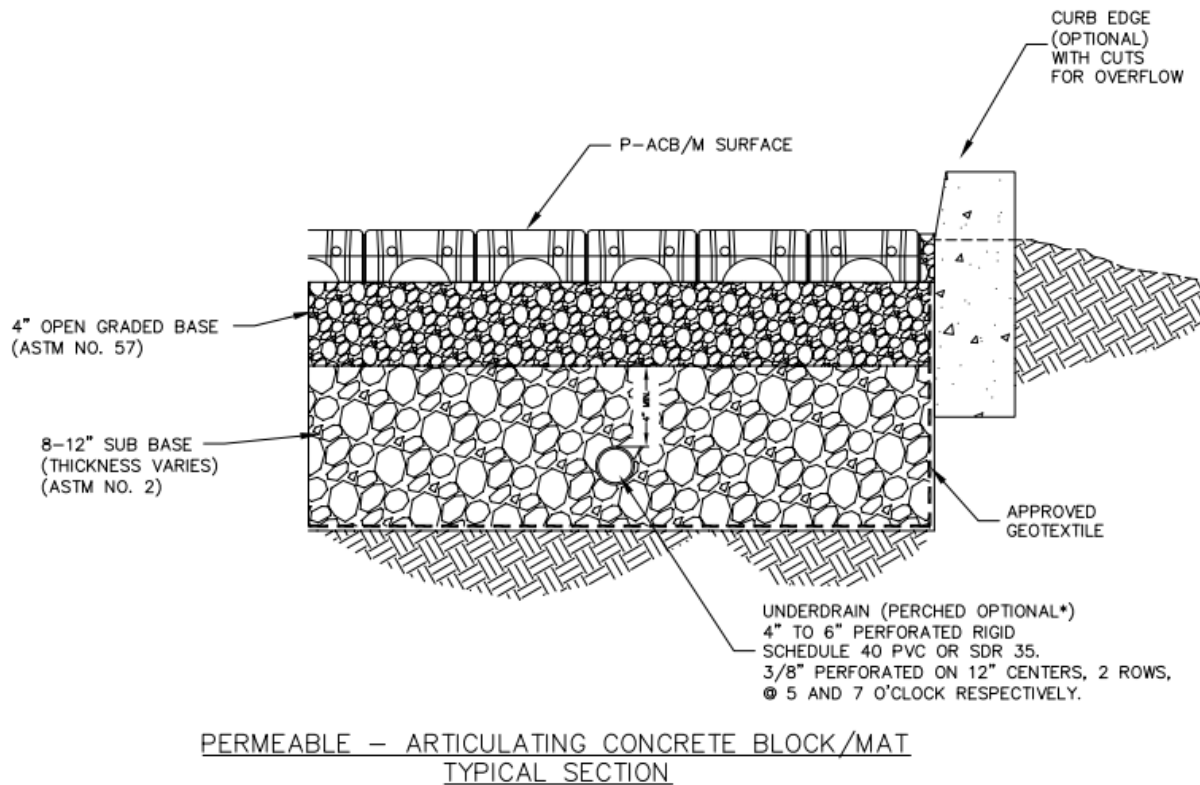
PaveDrain – Articulating concrete block/mat typical section
